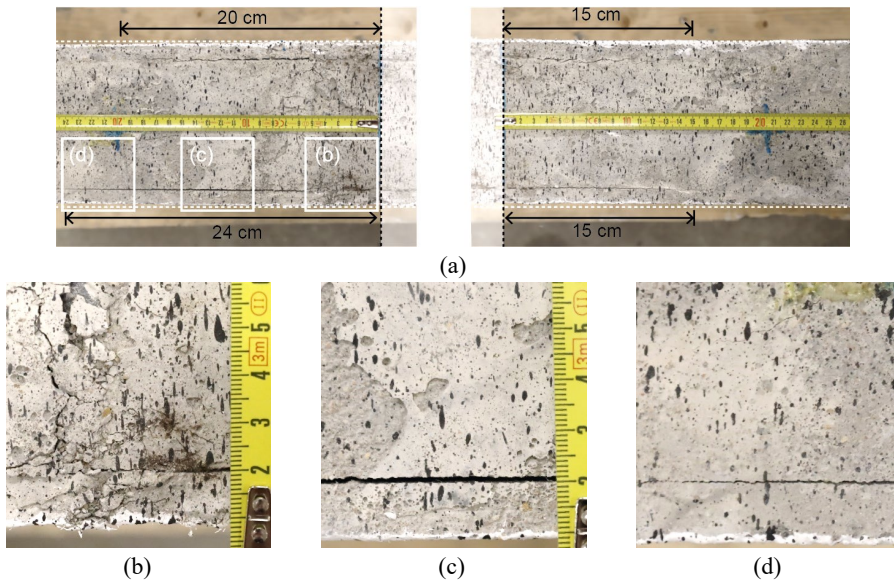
Top view of hybrid beam loaded at full width (Hybrid-1) after test.
